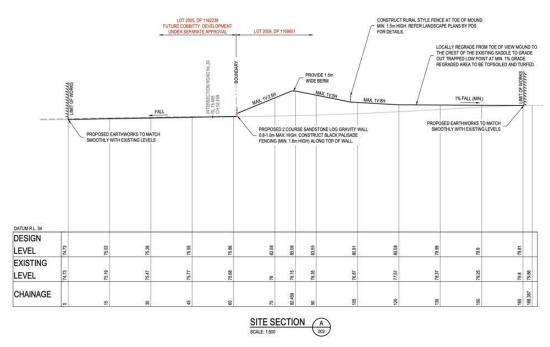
Site Section A (Plan 003, Site regrading Sections 01 of 02)
